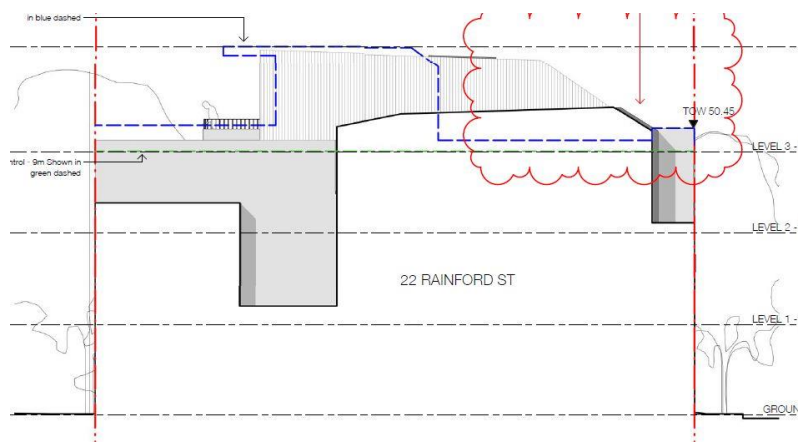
Proposed west elevation. Existing building line shown dashed blue.
